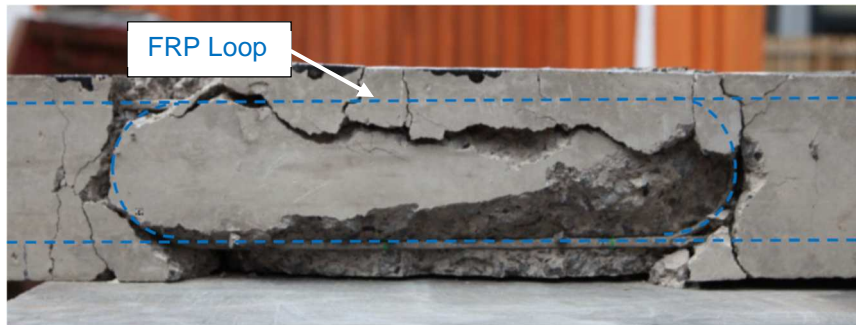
Concrete shear along loops overlap failure of specimen E1 (bottom view).
